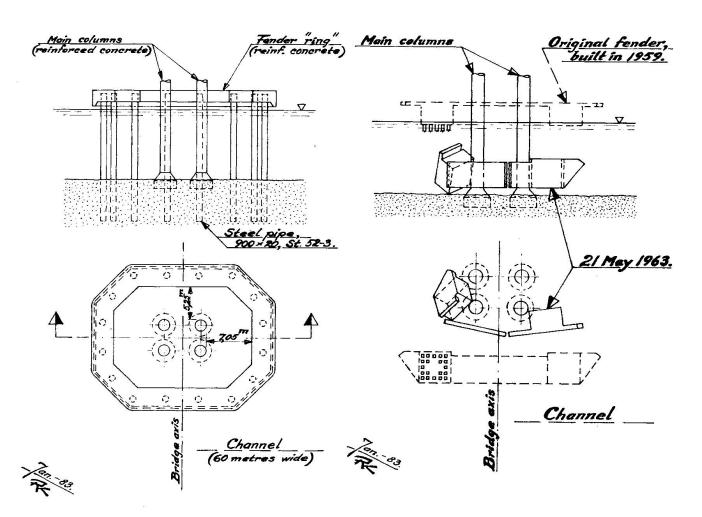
Tromsø Bridge: Western fender before and after having been destroyed. (The destroyed fender was partly resting on heaps of broken piles, which are not shown on the figure).
